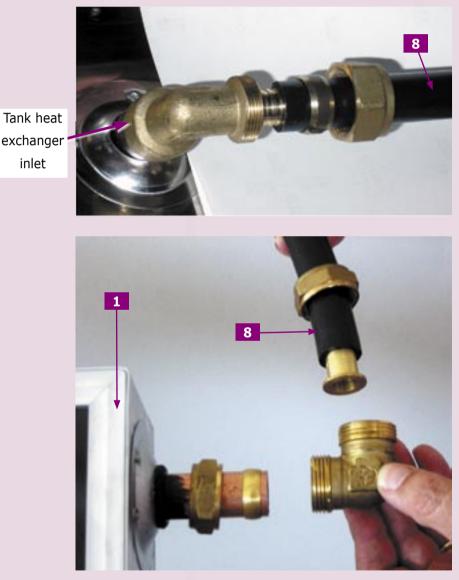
shows the connection pipe and the fittings between the collector outlet and the inlet to the heat exchanger of the tank.
